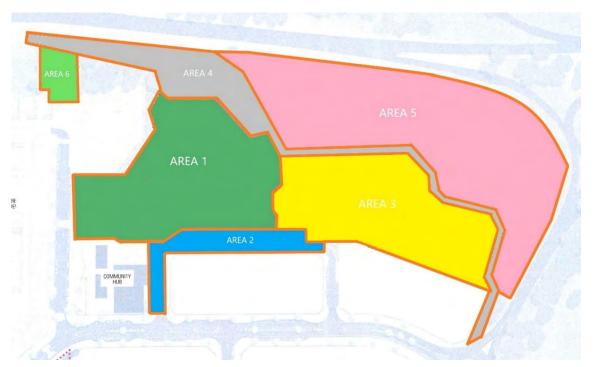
Stages of public open space construction (concept design by Playstreet)
